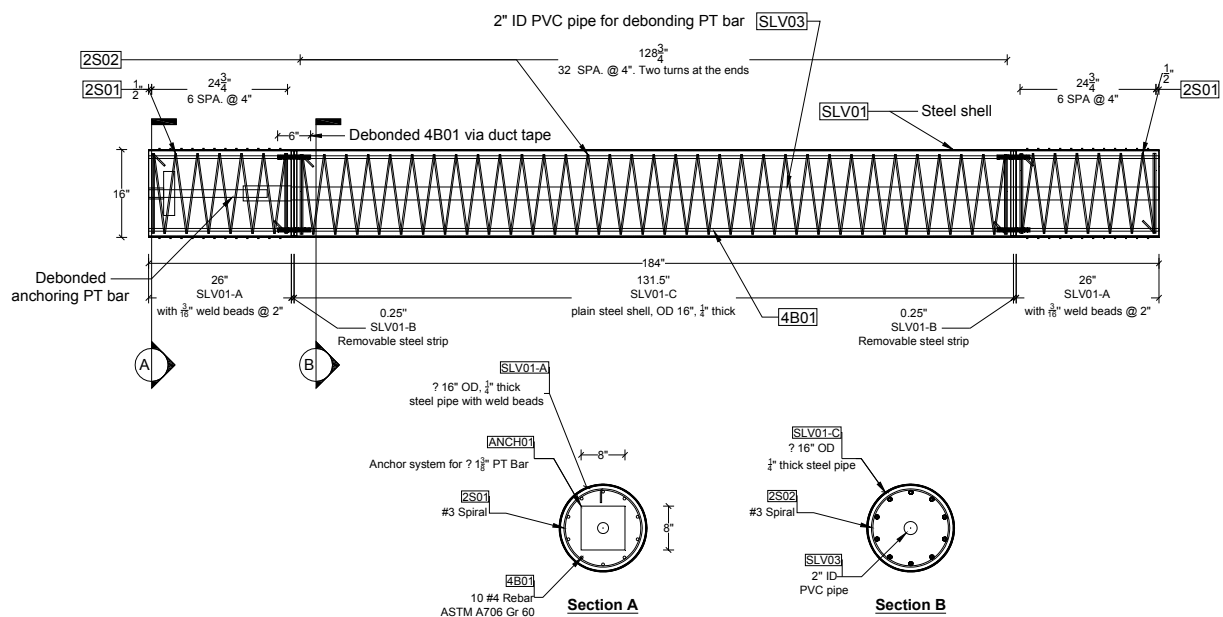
Dimensions and reinforcement details for the column (Nema, 2018).
